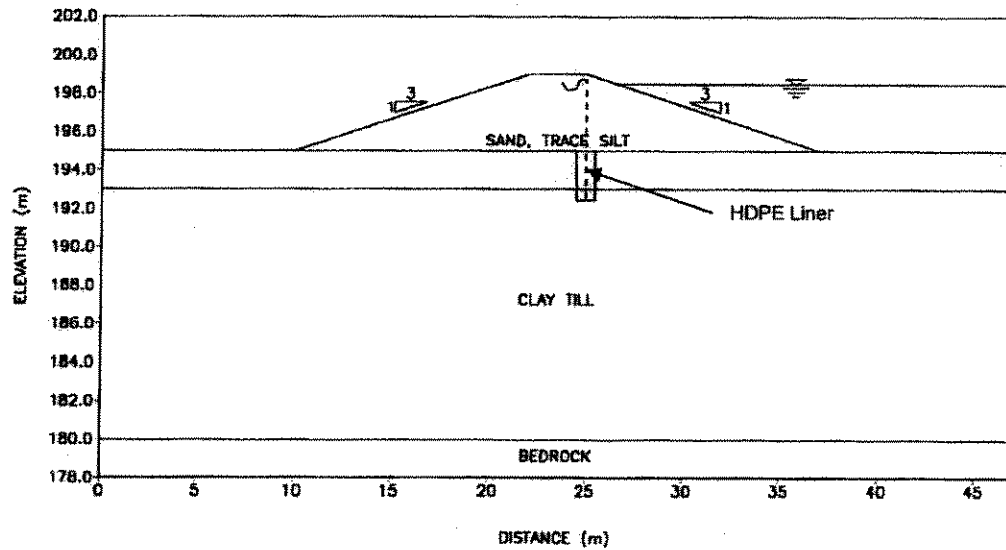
Proposed Layout of HDPE Liner (Option 2)
